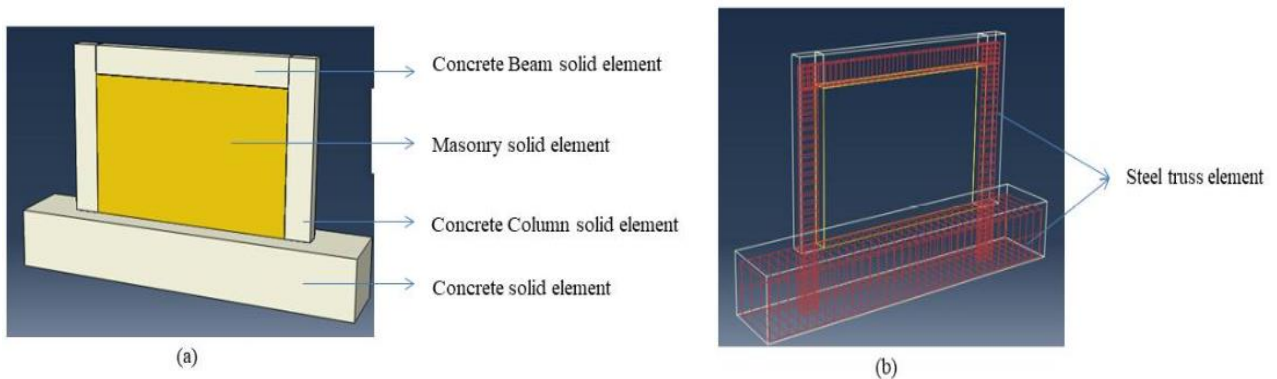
(a) Solid element for concrete and masonry, (b) Truss element for the steel rebars
